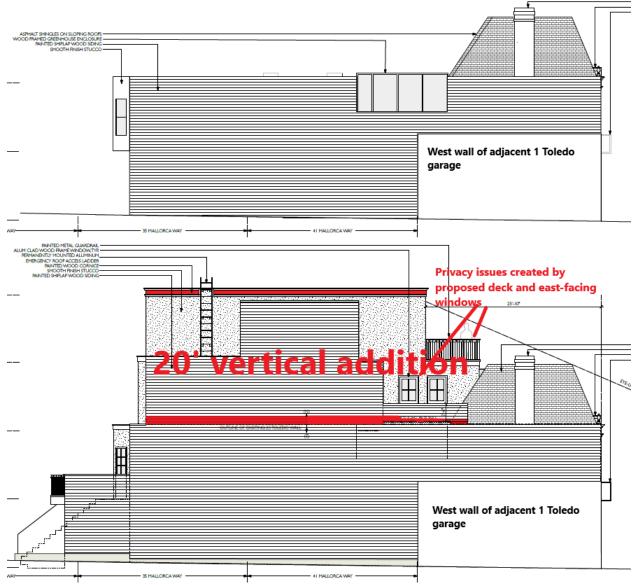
Existing and Proposed West Elevations -- Project results in light and privacy issues for 1 Toledo Apartments
